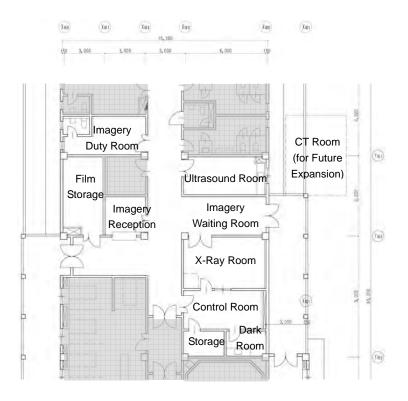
Imagery Dept. Plan Scale: 1/200
